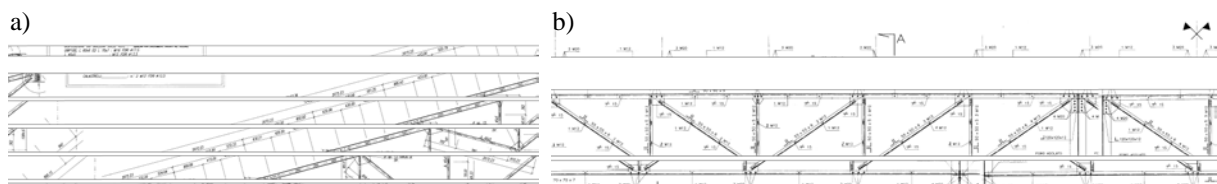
Single-bay structural cross-sections of trusses in x - (a) and y -direction (b).
